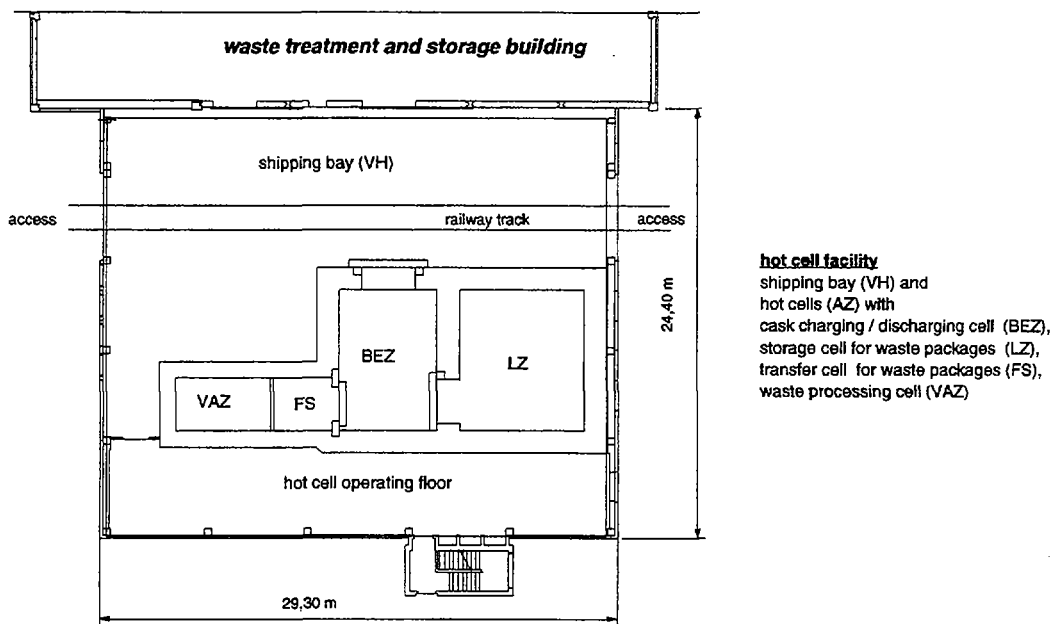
Simplified ground plan of the hot cell facility as part of the waste treatment and storage building
